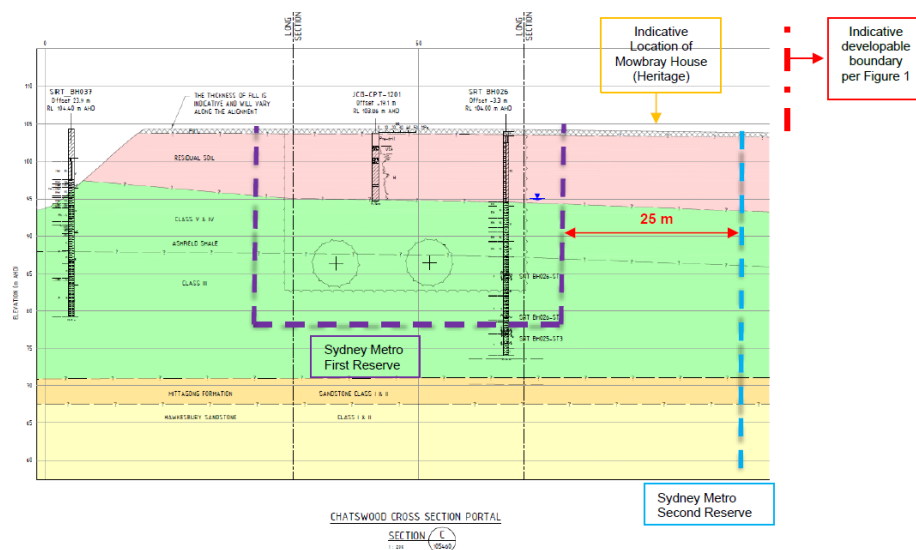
Cross section of Chatswood 'Dive Site' soil typology (Source: PSM)
